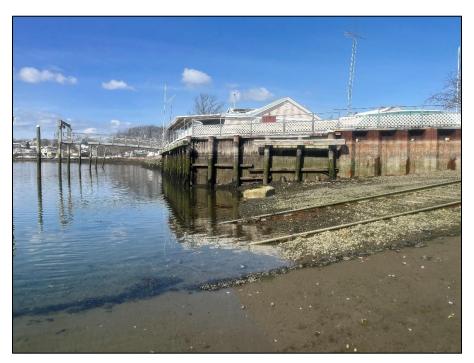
Bulkhead adjacent boatyard ramp. Photo taken facing north.
